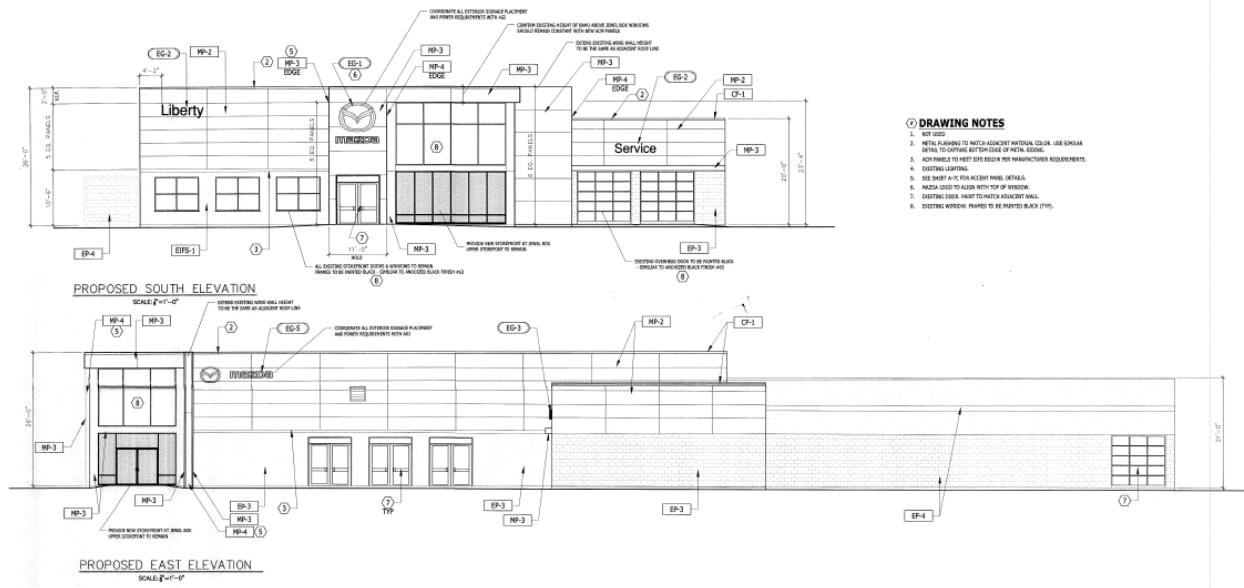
South/East Façade Elevations – PDS Engineering 2021
